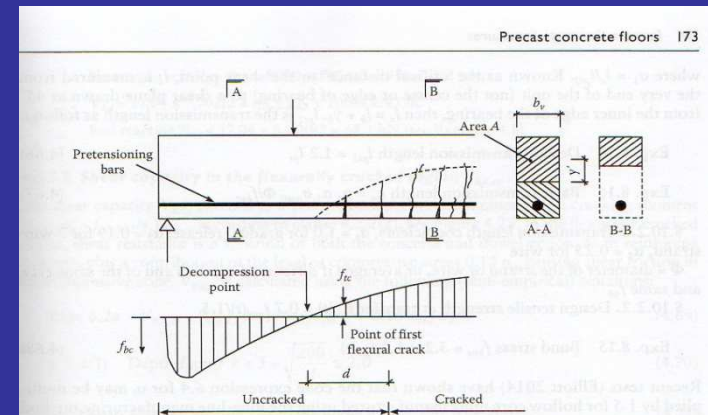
Principles of shear resistance for prestressed concrete elements.
